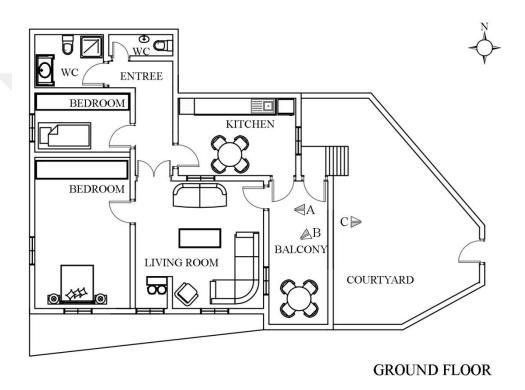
Mehmet Turnalı House ground floor plan (S.Sevimbige archive, 2017)
